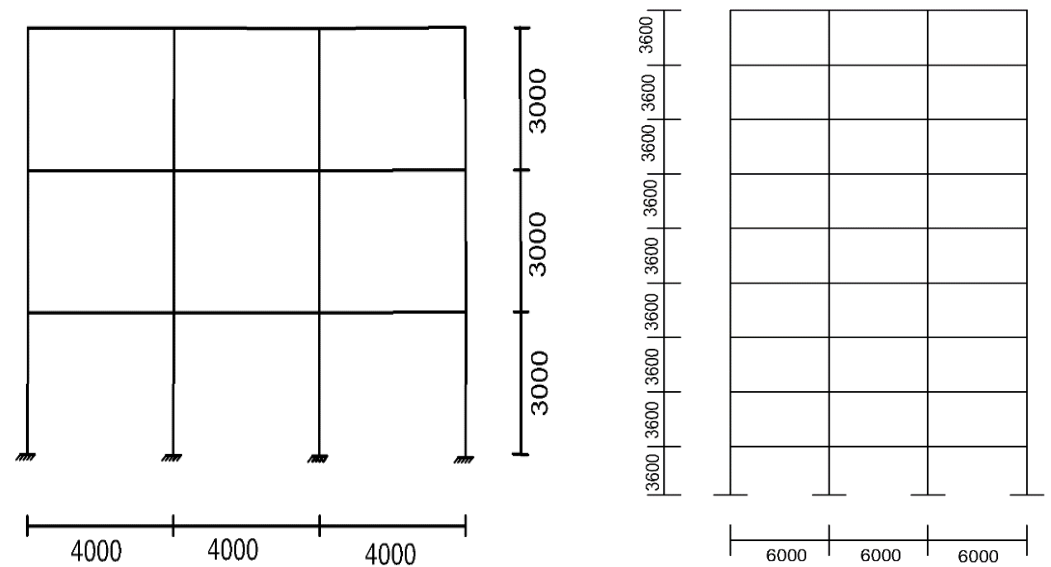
Elevations of the 3- and 9-story RC frame structures (unit: mm).
